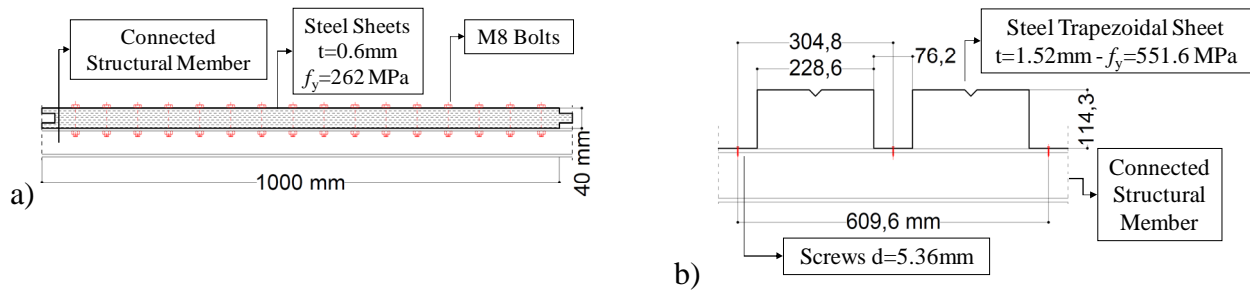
(a) Sandwich panel; (b) Trapezoidal sheeting.
